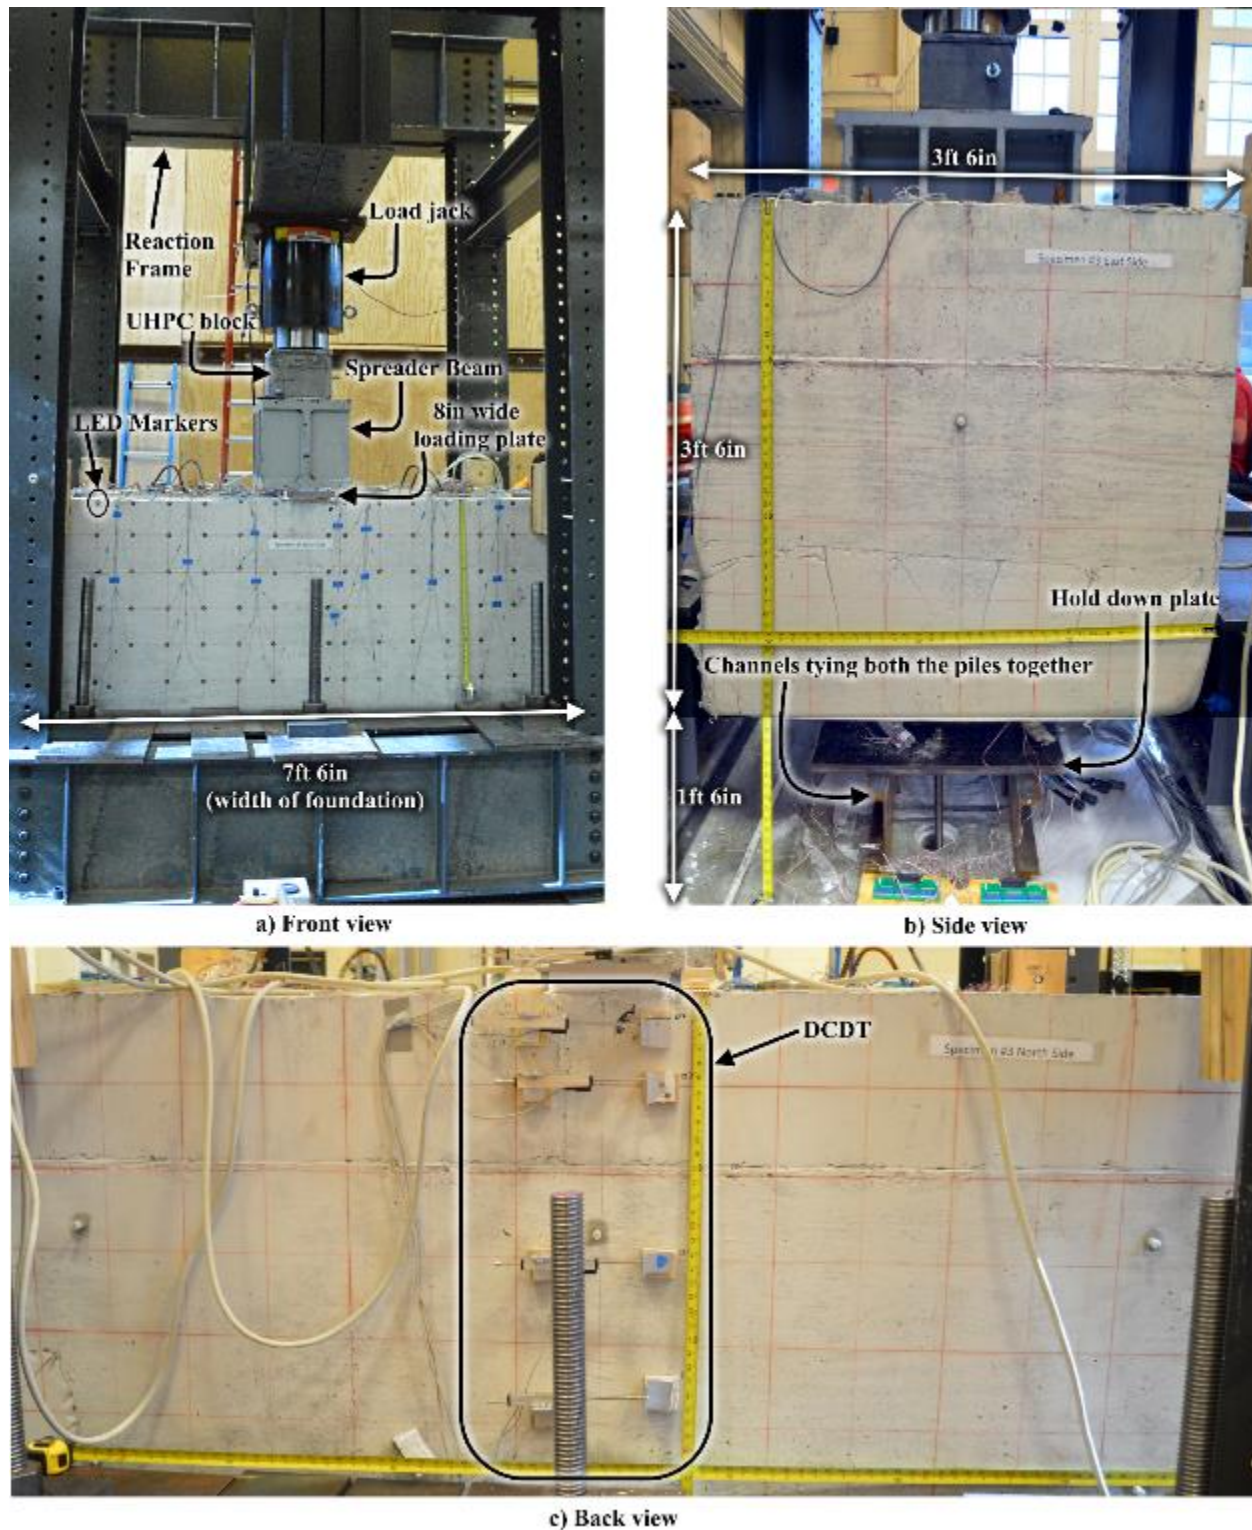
Figure showing typical test setup for specimens #3 and #4
